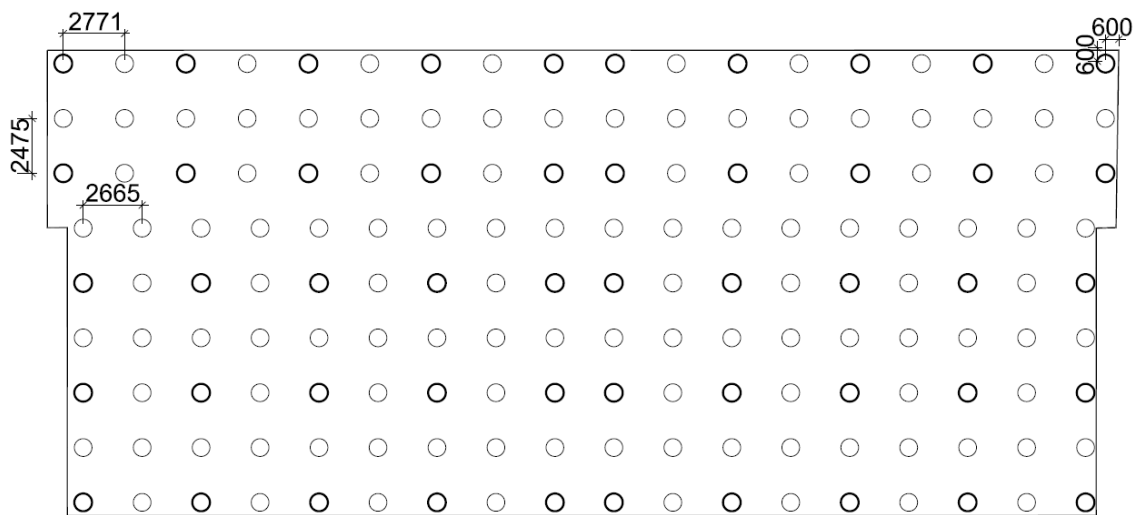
Original and altered arrangement of piles (*dimensions are in mm*)
